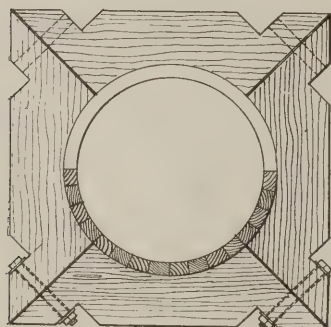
A Better Type of "Form" Construction for Cylindrical Columns.
